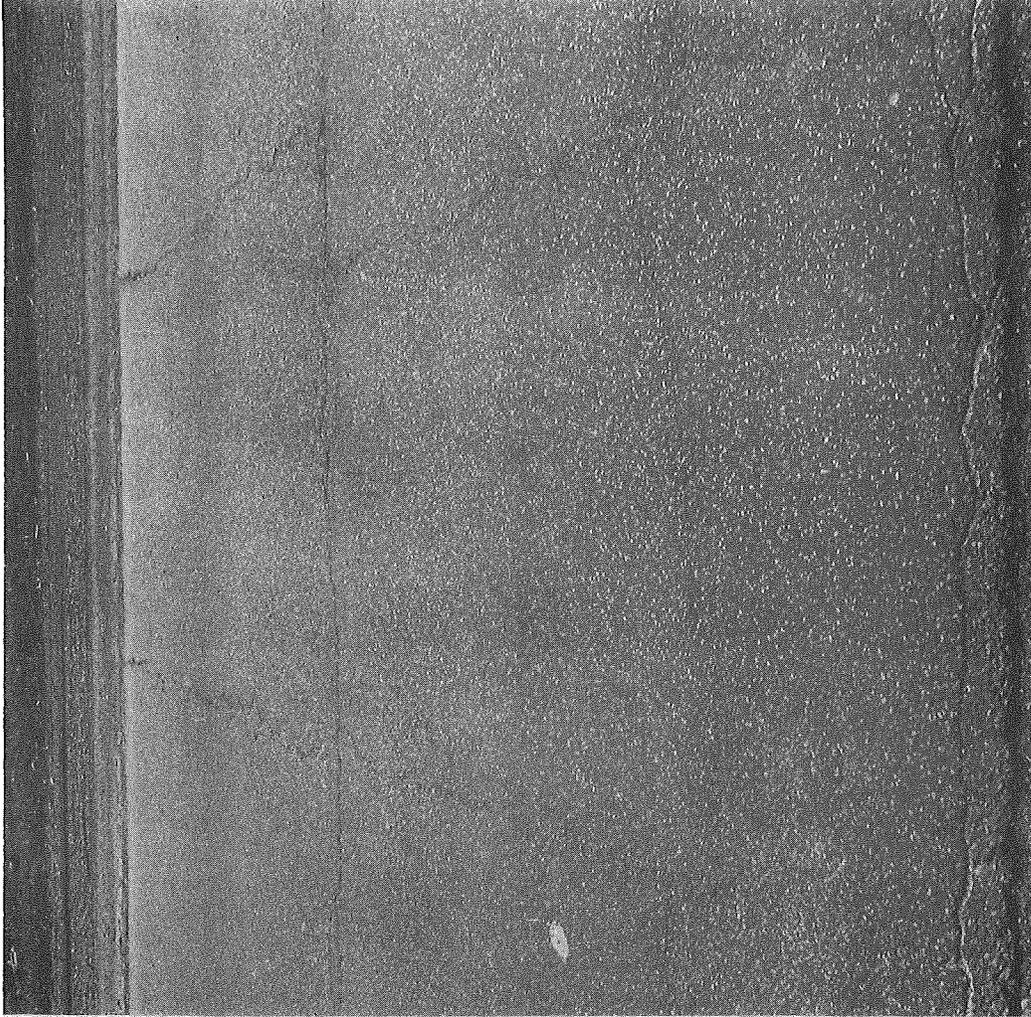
Typical transverse and longitudinal reflection cracking. Note longitudinal cracking reflecting underlying centerline joint at center of pavement and short longitudinal cracks in foreground.
